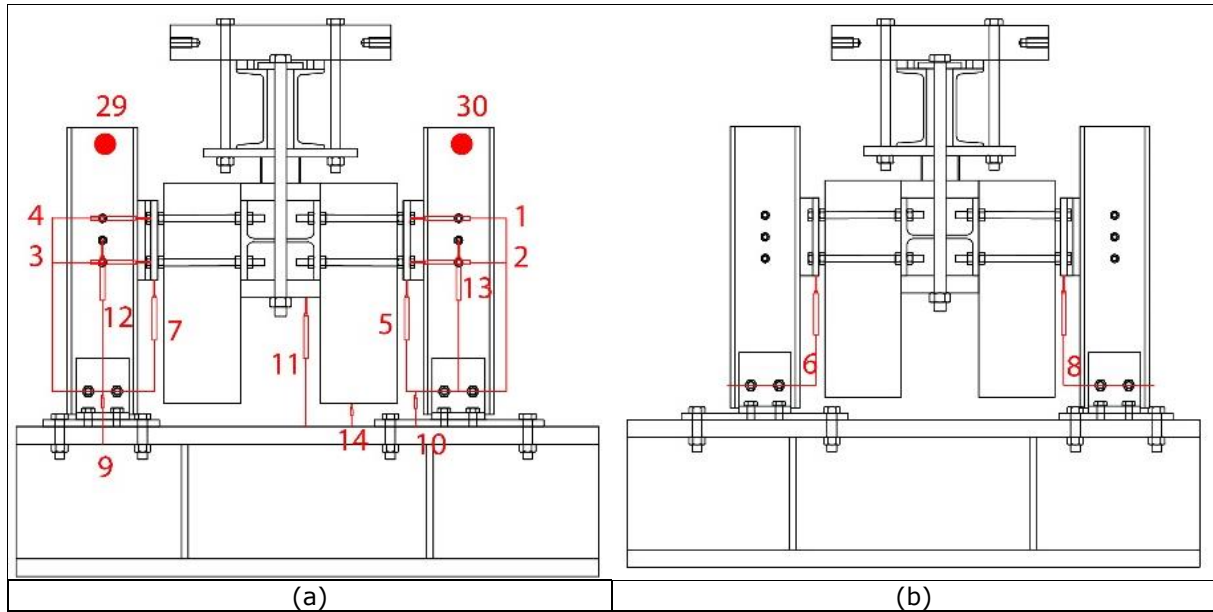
LVDTs and inclinometers position on Detail 4: (a) front side; (b) back side.
